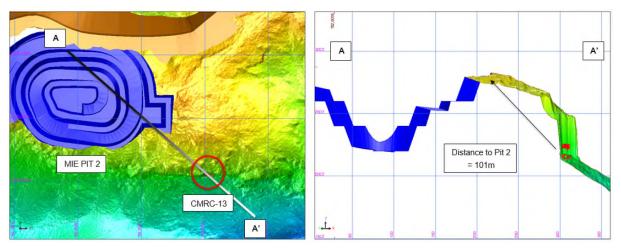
Cross-section of Cave CMRC-13 (Category 4) and Miralga East Pit 2
